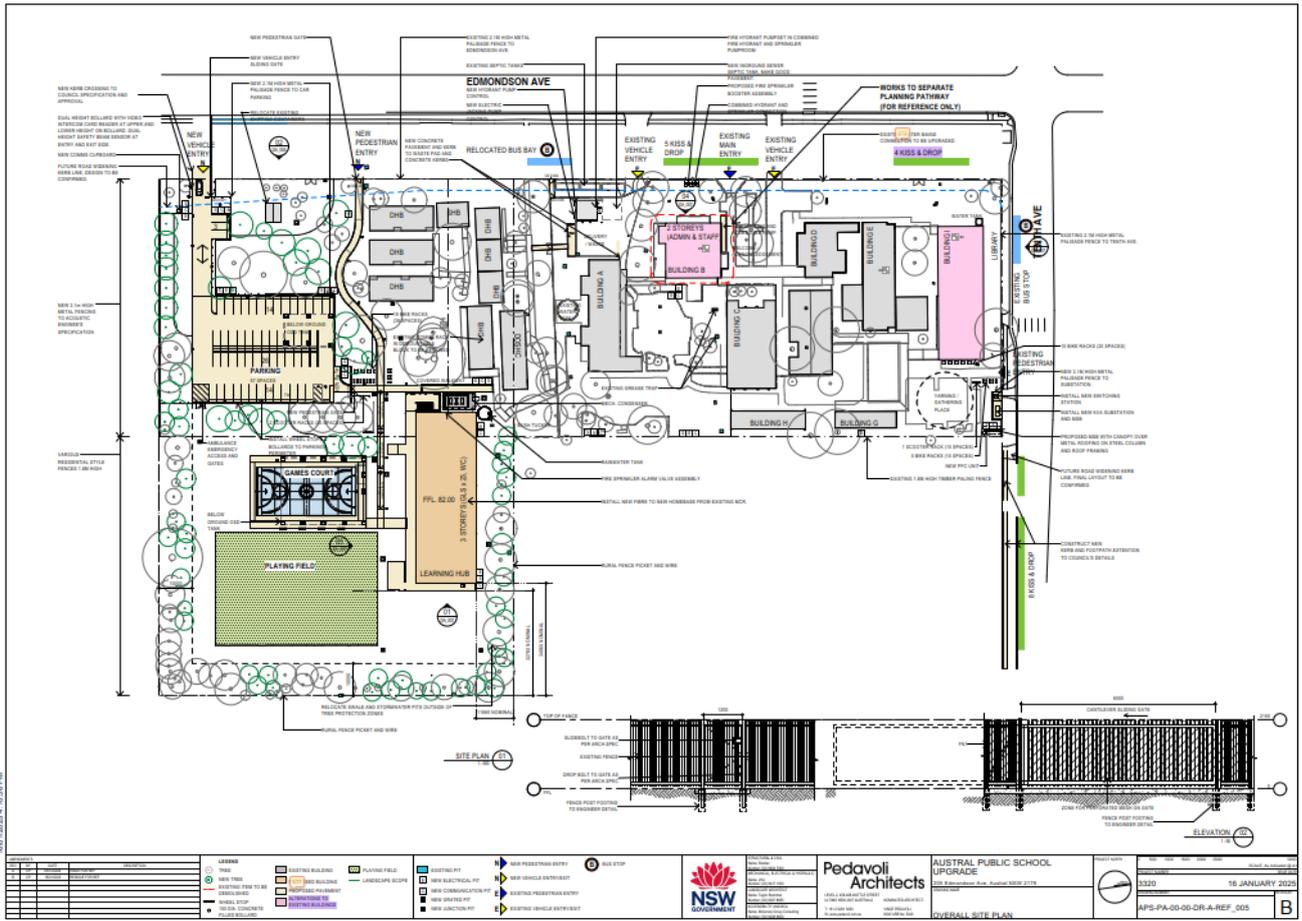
Proposed Site Plan (Source: Pedavoli Architects, Overall Site Plan (Rev B))
